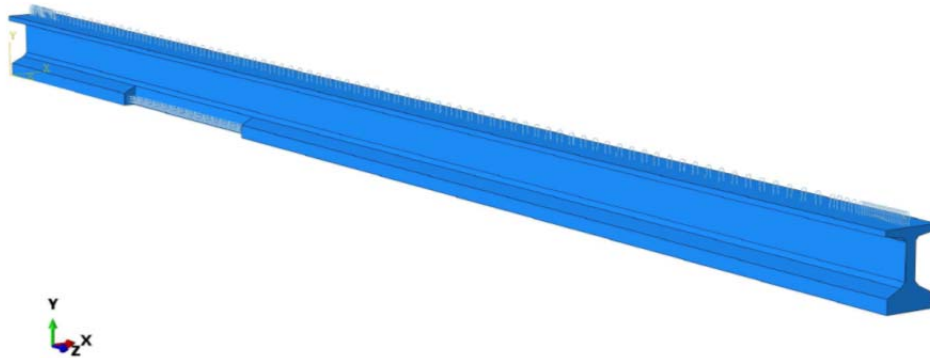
ABAQUS. Damaged Girder Model
